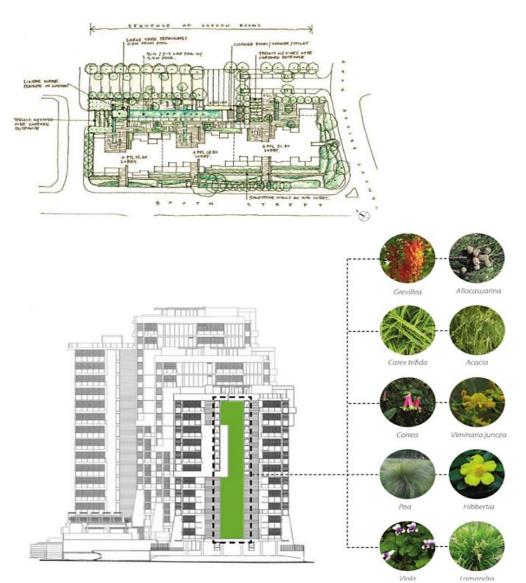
Plan and elevation showing greenery location (CTBUC, 2014)
